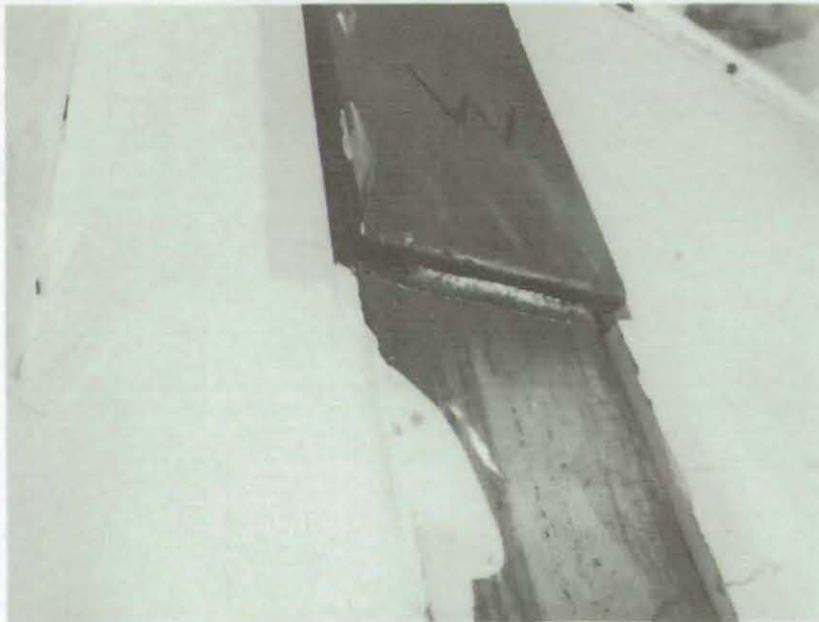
West added column. Weld of bottom of 5/8" x 6" x 24" plate to flange of added column.
